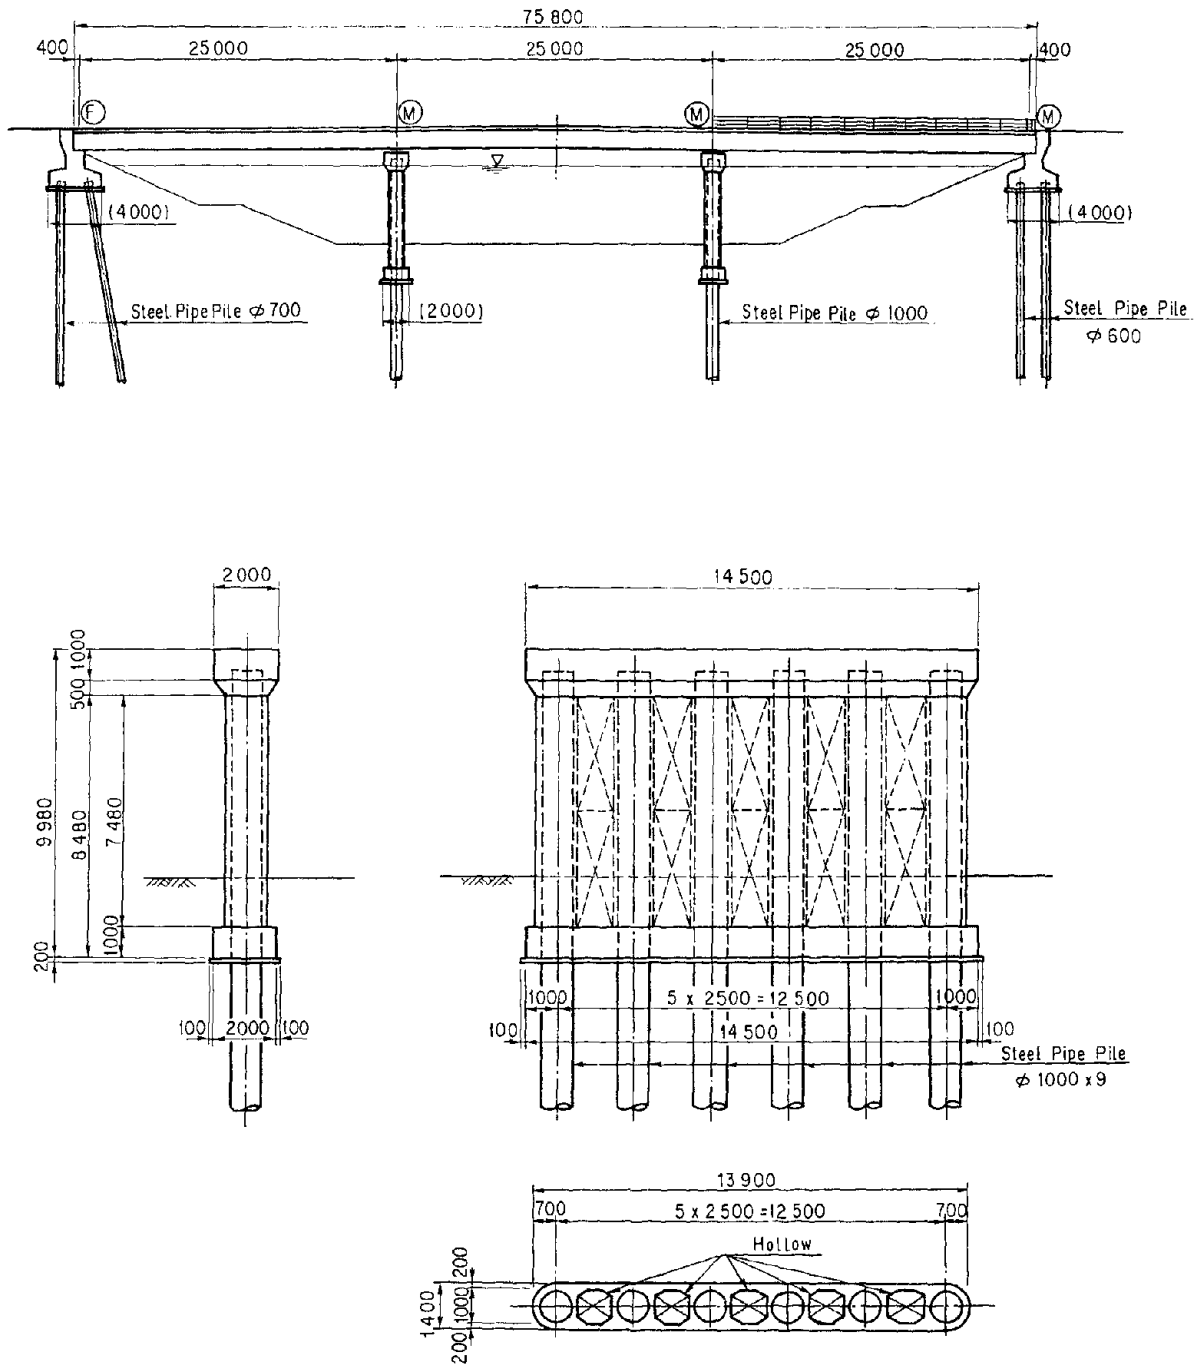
Seismic Strengthening of Bent Piles by Placing A New Reinforced Concrete Wall
